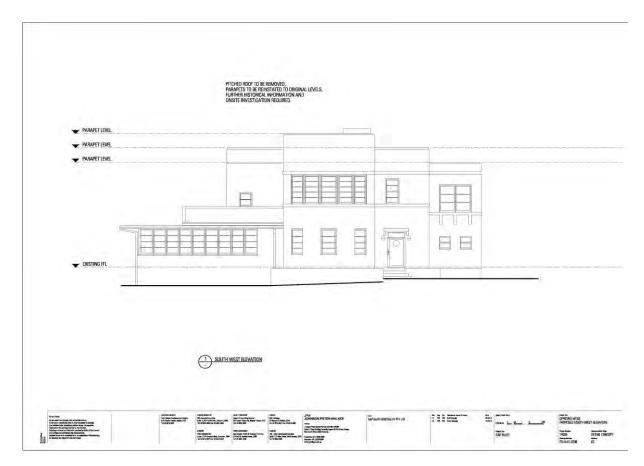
Proposed elevation, showing the reconstructed roofs of the Officers' Mess. (Source: JPW 2015)
